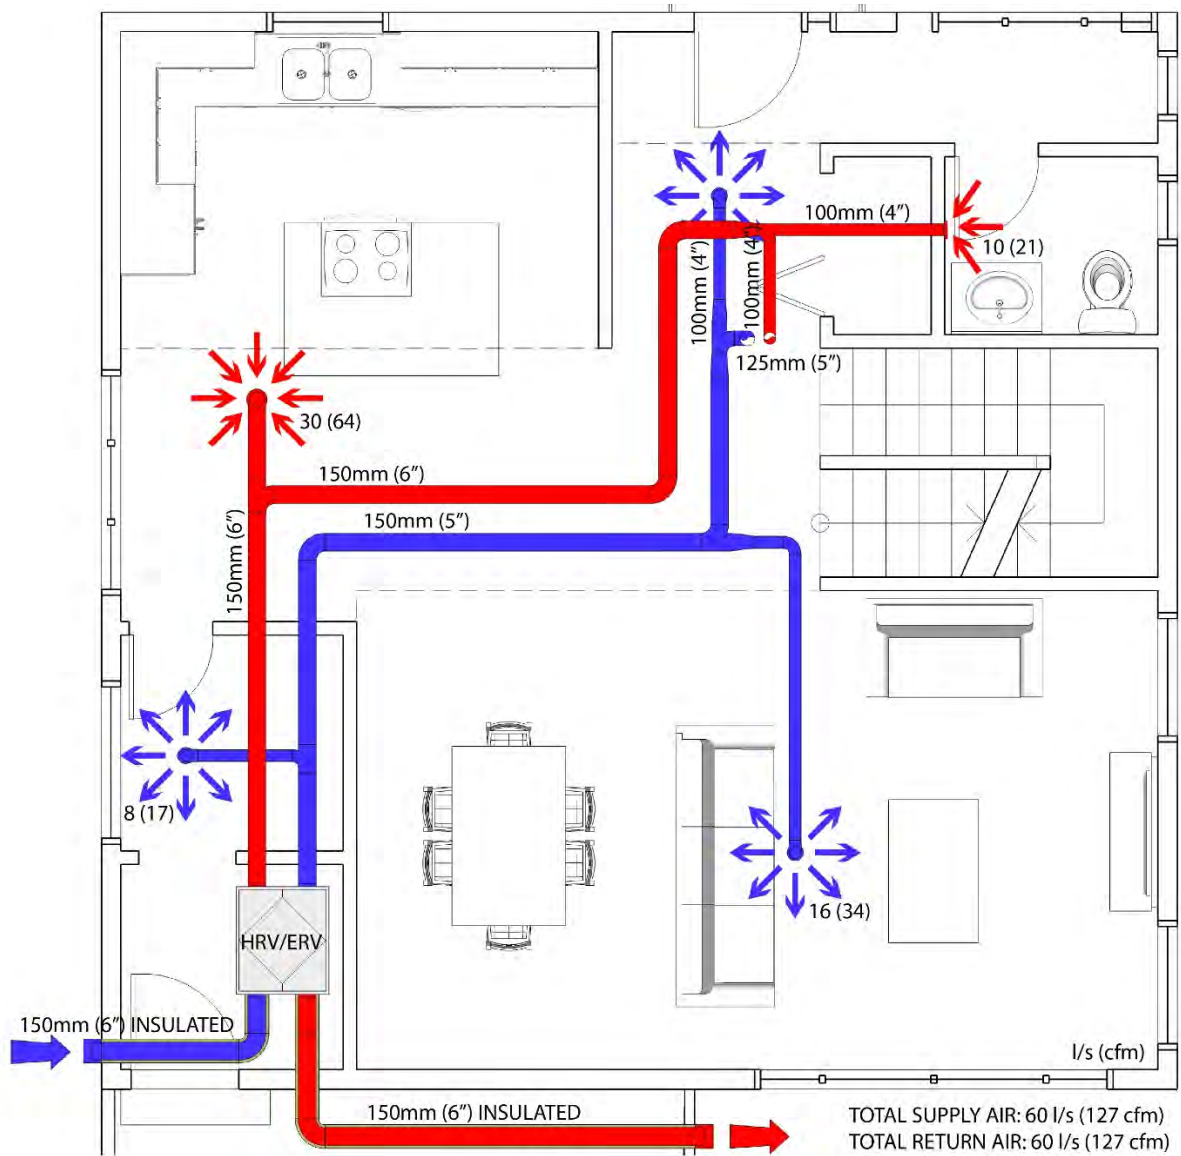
Fig C: Example schematic HRV / ERV trunk & branch ducting system layout, main floor
